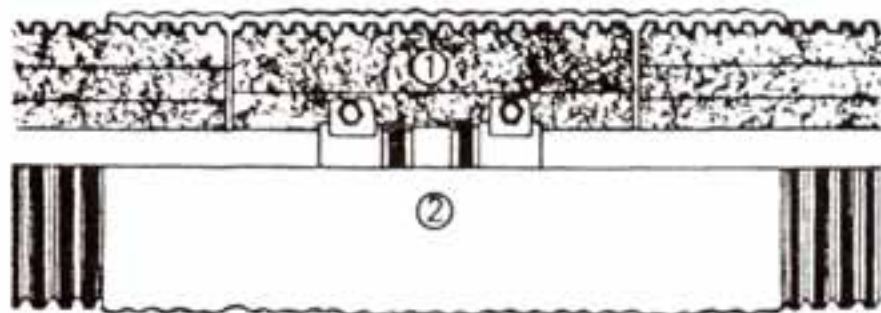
Pipe Connection with Extra Thermal Insulation and Shrink Sleeves
